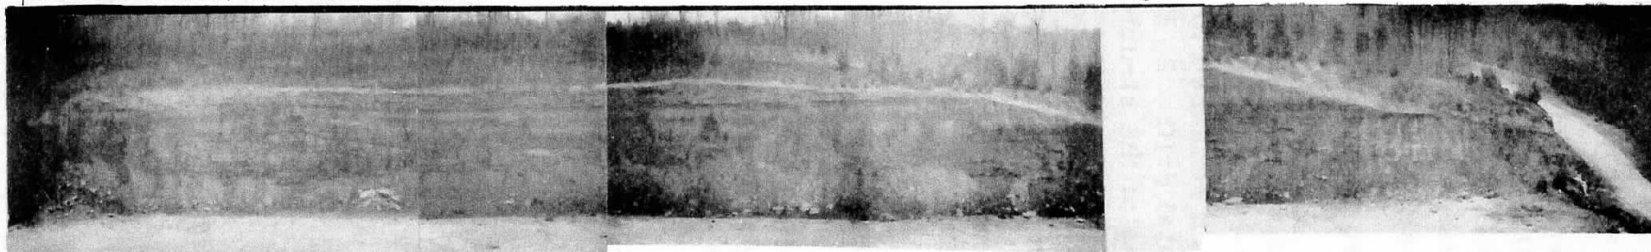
FIG. E WEST END OF SOUTH WALL OF SPILLWAY, CAGLE'S MILL
